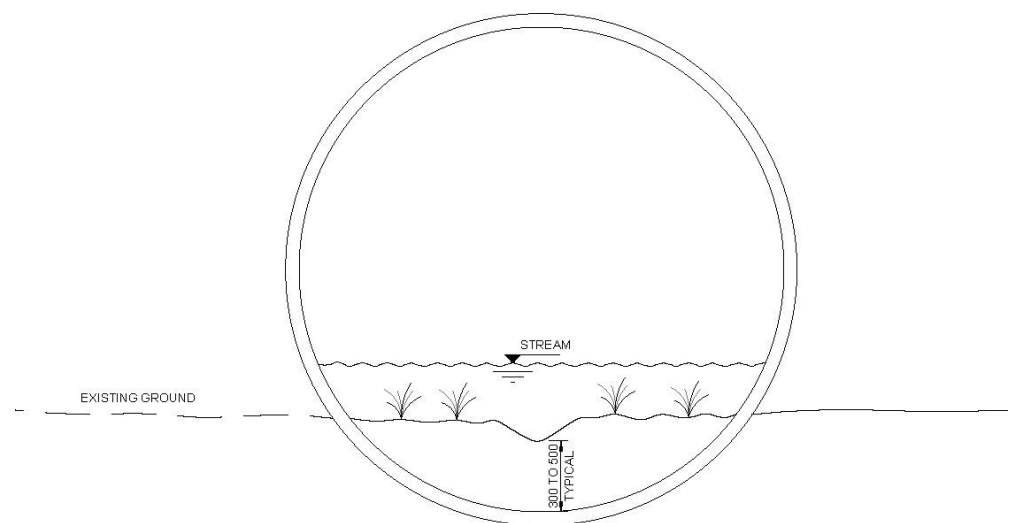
Fish Passage Type 2 (Shallow Grade Culverts)
